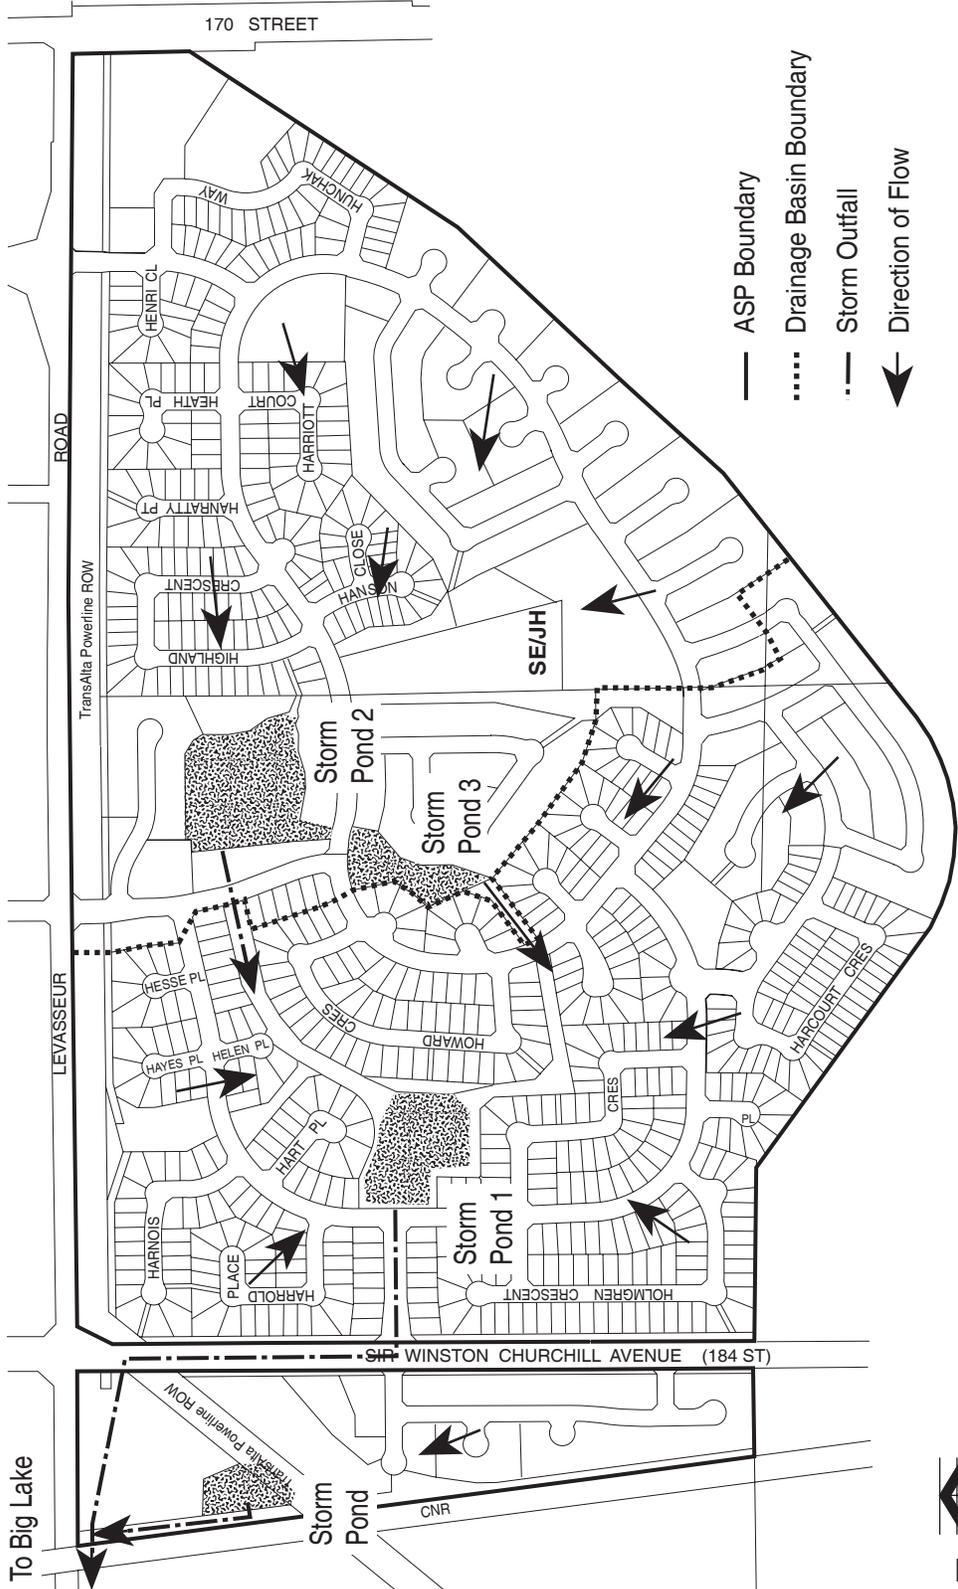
STORM SERVICING CONCEPT PLAN (Bylaw 1/95)
